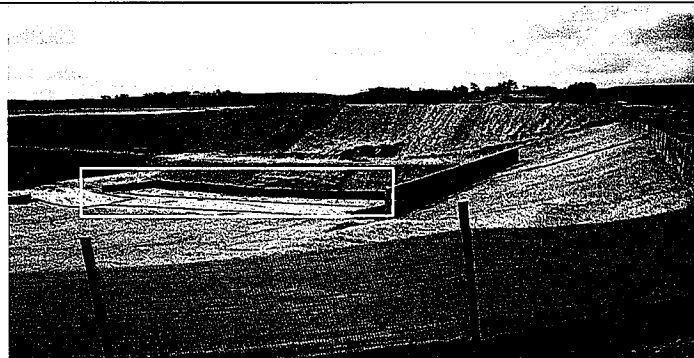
Long Valley Wash bridge (right). Insert shows earthen berm/dyke constructed in natural water way which is a violation of the construction storm water permit. Natural water way is used as a BMP.
